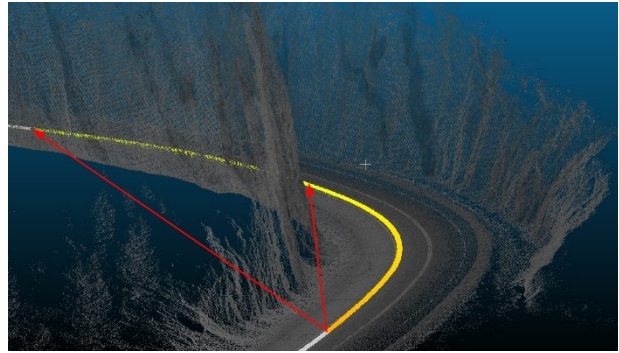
Road Section (9) - Frame 844 VISTA Outputs
